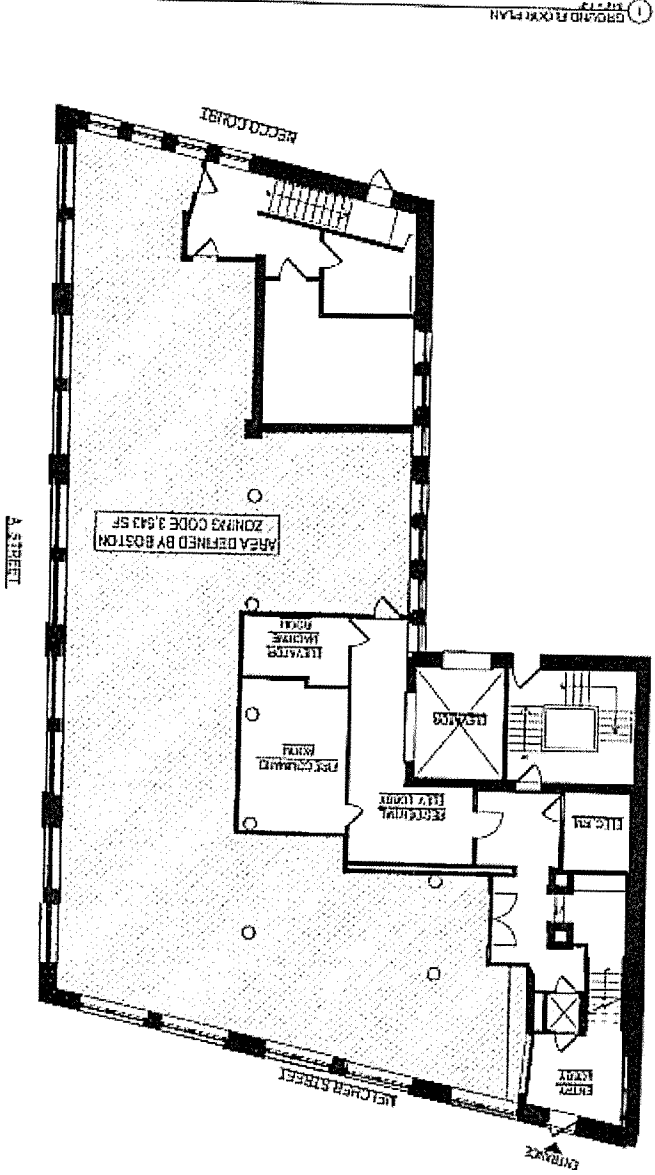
Melcher Street Ground Floor Plan
